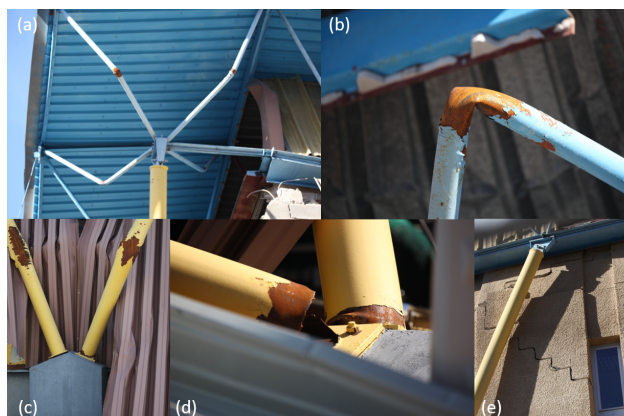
Close-up views of the damages to the structure of the Irstea Cévennes hall, as observed on March 18, 2018: buckling and bending failure of roof tubular profiles (a,b), bending and shear failures of tubular supporting pylons (c,d) and cracking of the inner offices' walls made of concrete and located along the southern face of the building.
